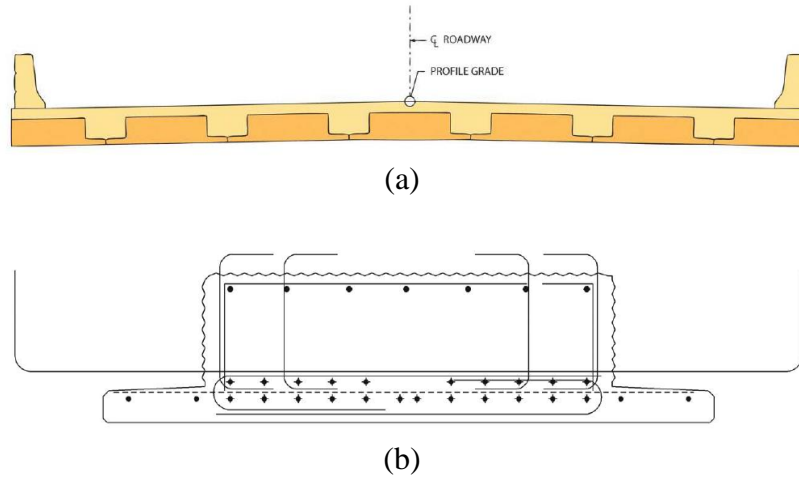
(a) Typical transverse section of a bridge with PCSS system; (b) typical MnDOT PCSS [47]
